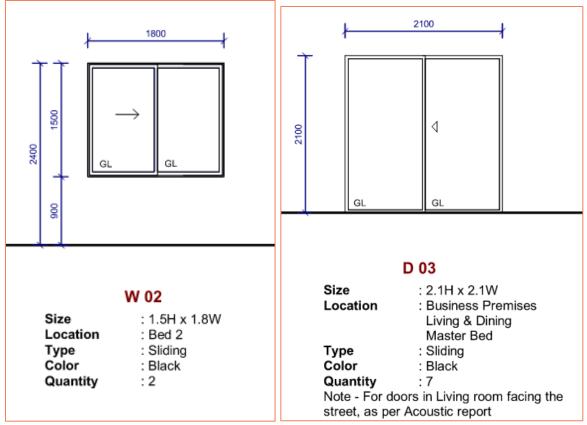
Subjected allowed non-FRL openings for First floor and Second floor
